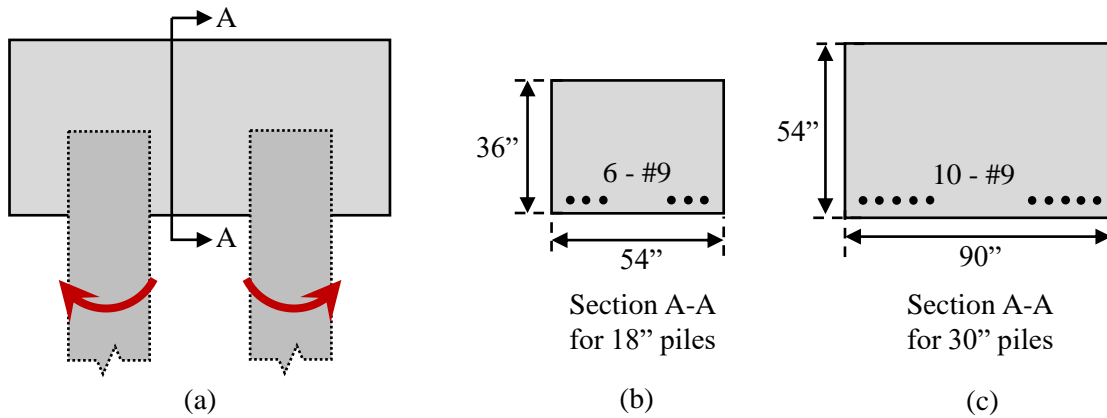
(a) Moment demand on pile cap for piles being pushed apart, (b) cross section with 18-inch pile and (c) cross section with 30-inch pile
